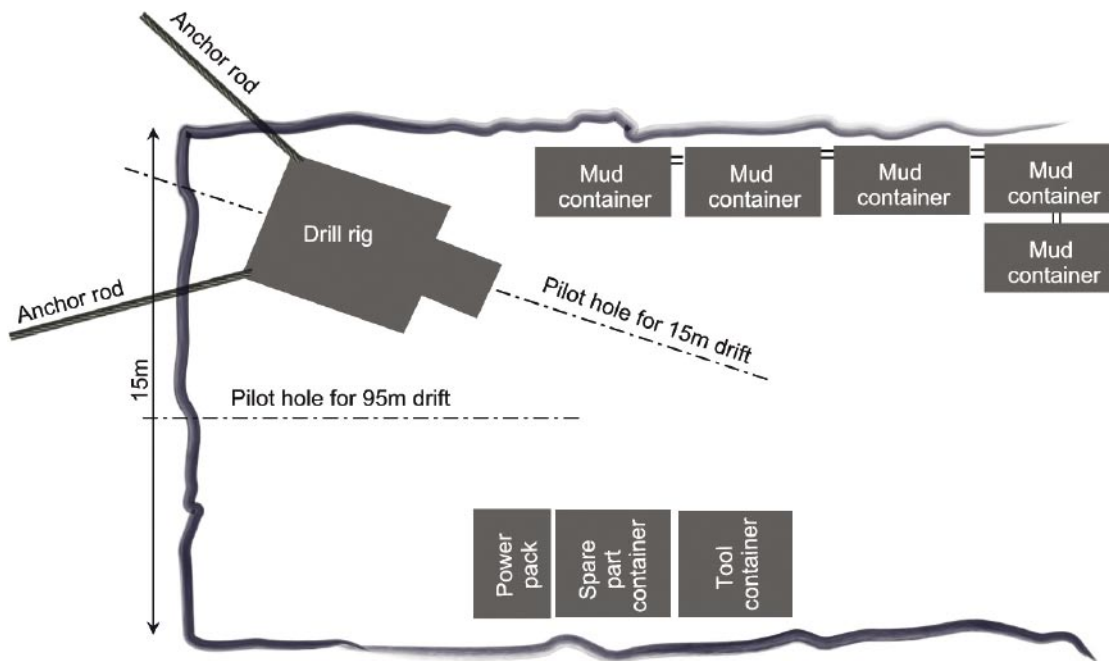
Sketch showing the initially planned set-up for the drill rig, mud containers and auxiliary equipment.
